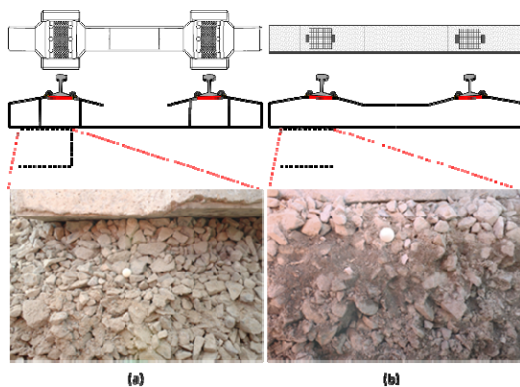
(a) Ballast Image 171 – Below the Inside Rail of HFT and (b) Ballast Image 150 – Below the Inside Rail of Conventional Concrete Tie
